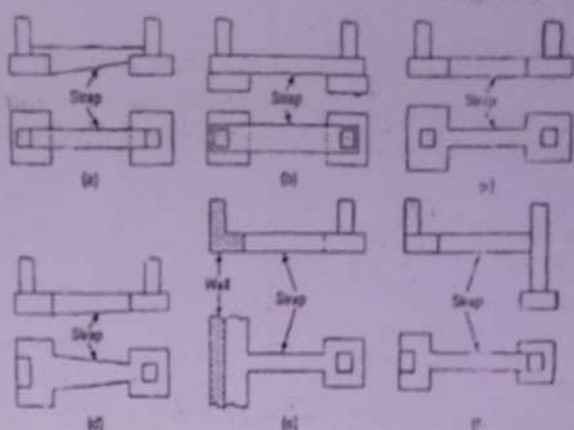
COMMON ARRANGEMENTS OF STRAP FOOTING.
